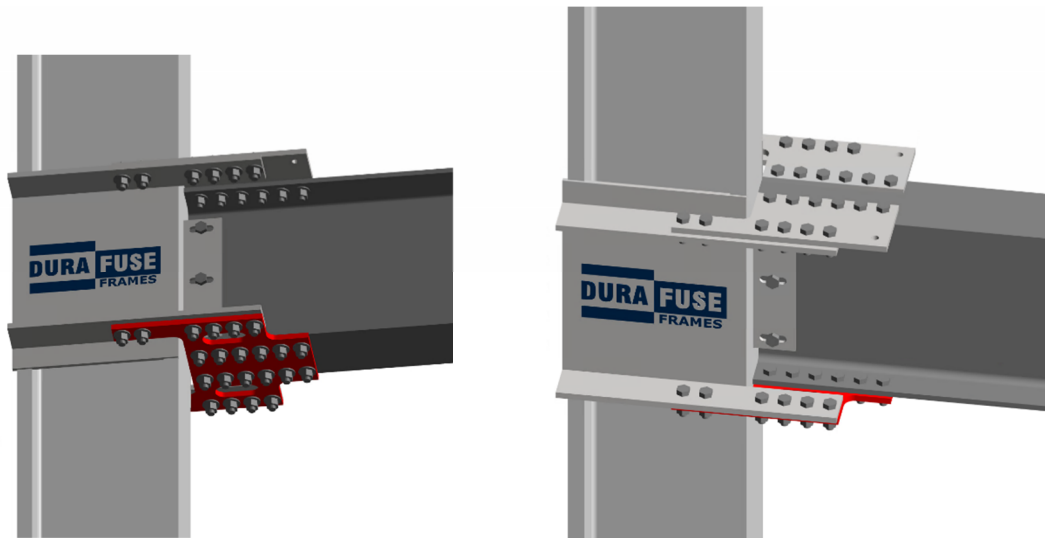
One-Sided DuraFuse Frames Connection (Bottom, Top Views)
